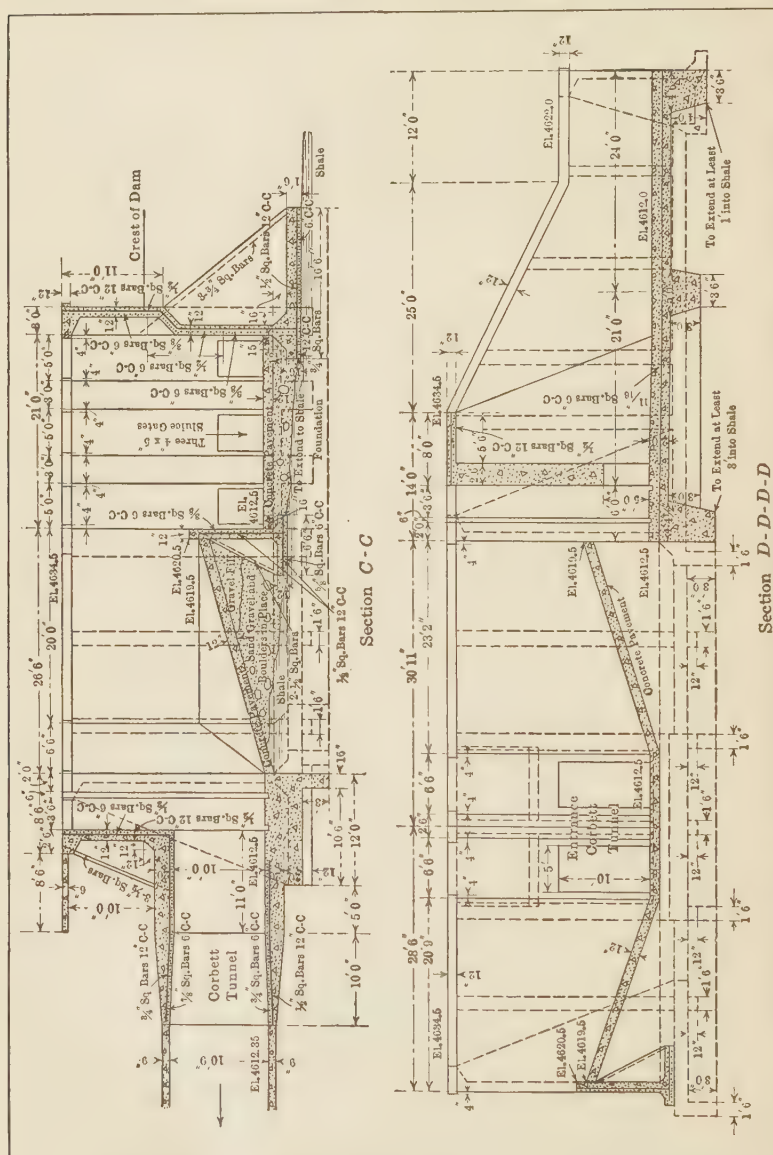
A.—Plan of Corbett dam and headworks at Corbett tunnel. Shoshone Project, Wyo.
